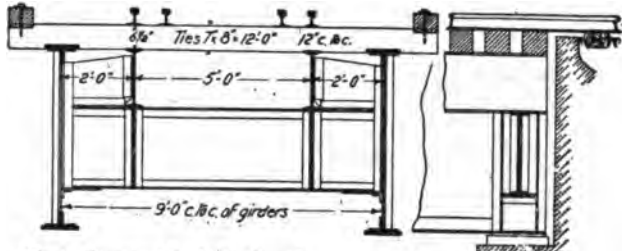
Standard Deck Girder BOSTON AND MAINE RAILROAD
